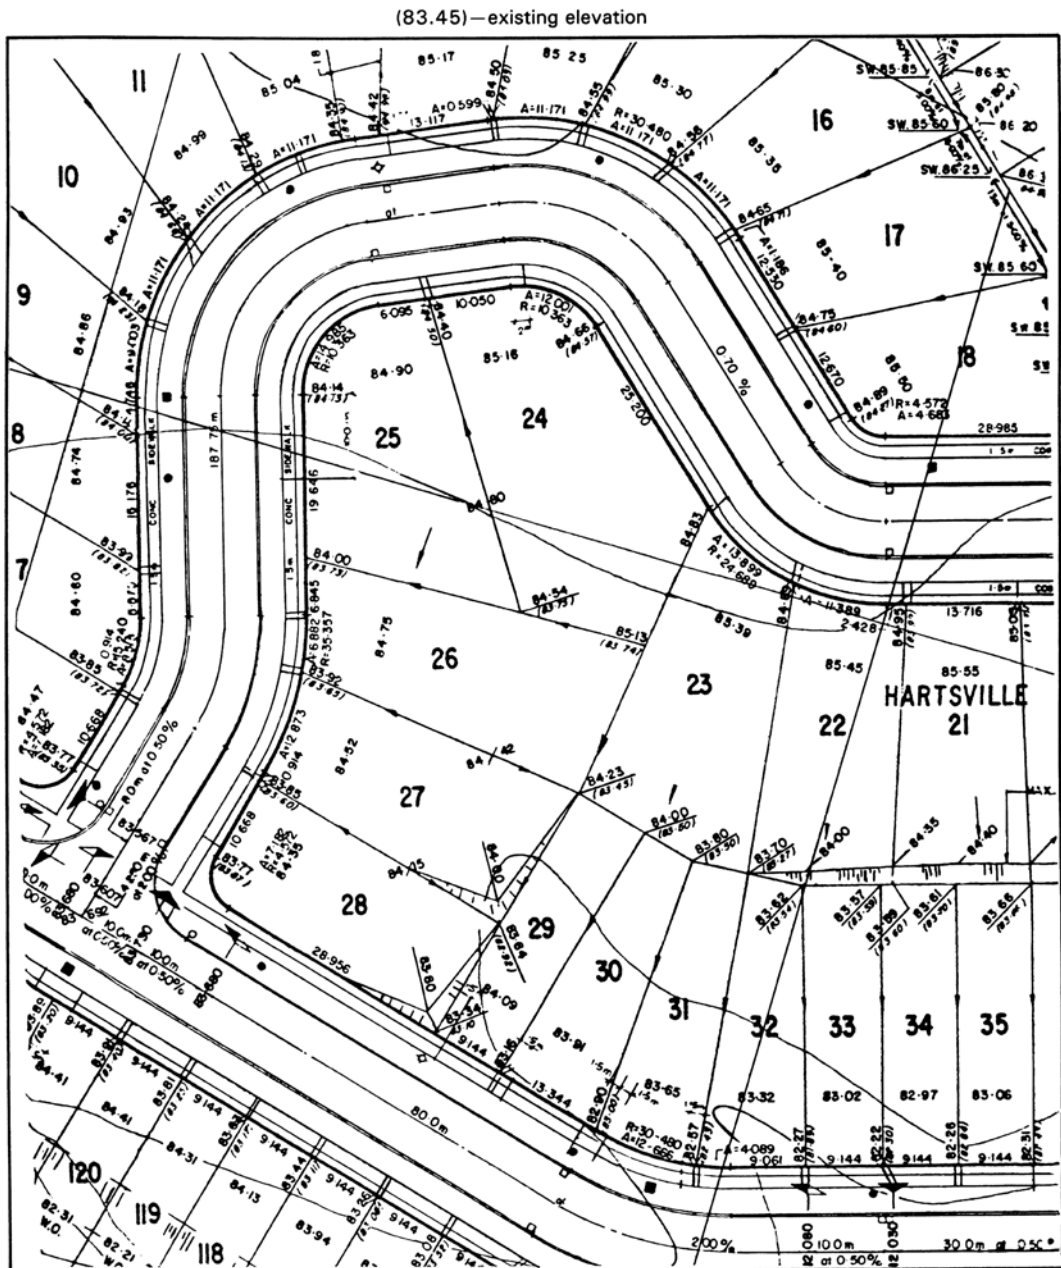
Site grading plan. Proposed elevation: 84.23. Existing elevation: 83.45.
